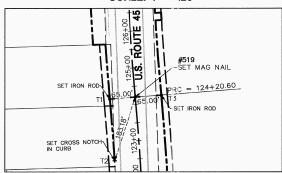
DETAIL OF POINT NO. 511 THROUGH 517 SCALE: 1" = 120'
